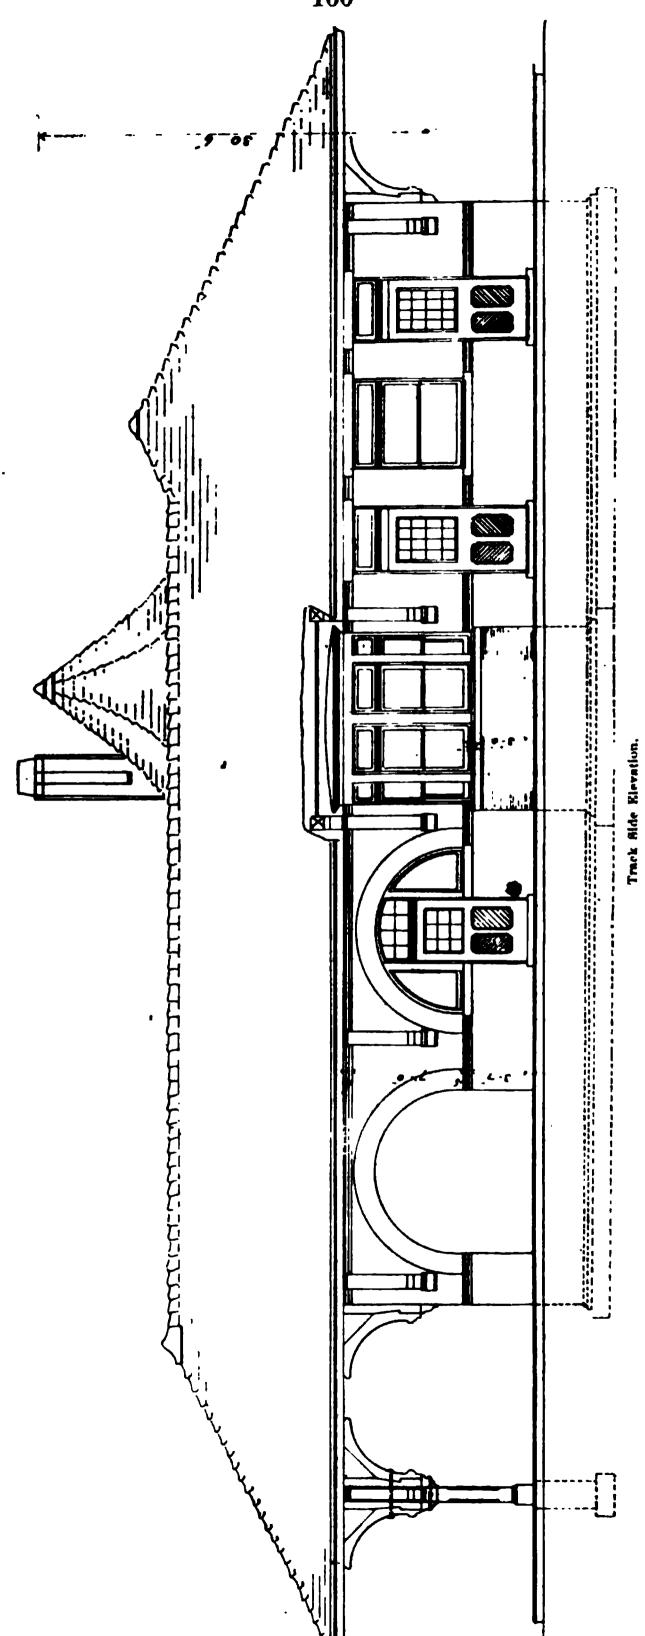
Track Side Elevation of Local Passenger Depot at Glen Cove, L. I., Long Island Railroad. (Plan No. 38, Committee Report on "Local Stations.")
